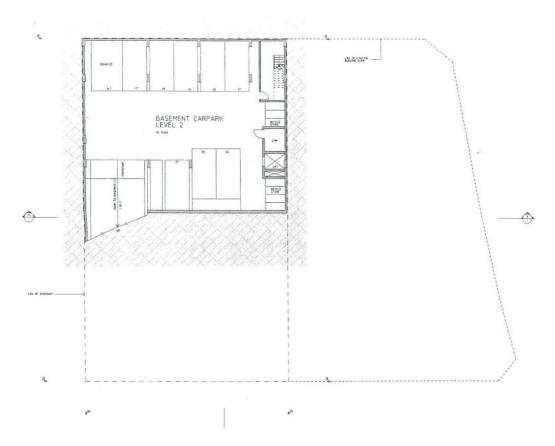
1999 – Basement Level 2 plan, prepared by Allen Jack + Cottier, architects, dated 8 December 1999 (Source: City of Sydney Archives, D1999/00812, 'Development Applications/26-32/Pyrmont Bridge Road/Pyrmont/Alterations & Additions to Existing Building – Bulawayo Holdings Pty Ltd – 14 10 99 - \$5000000')
